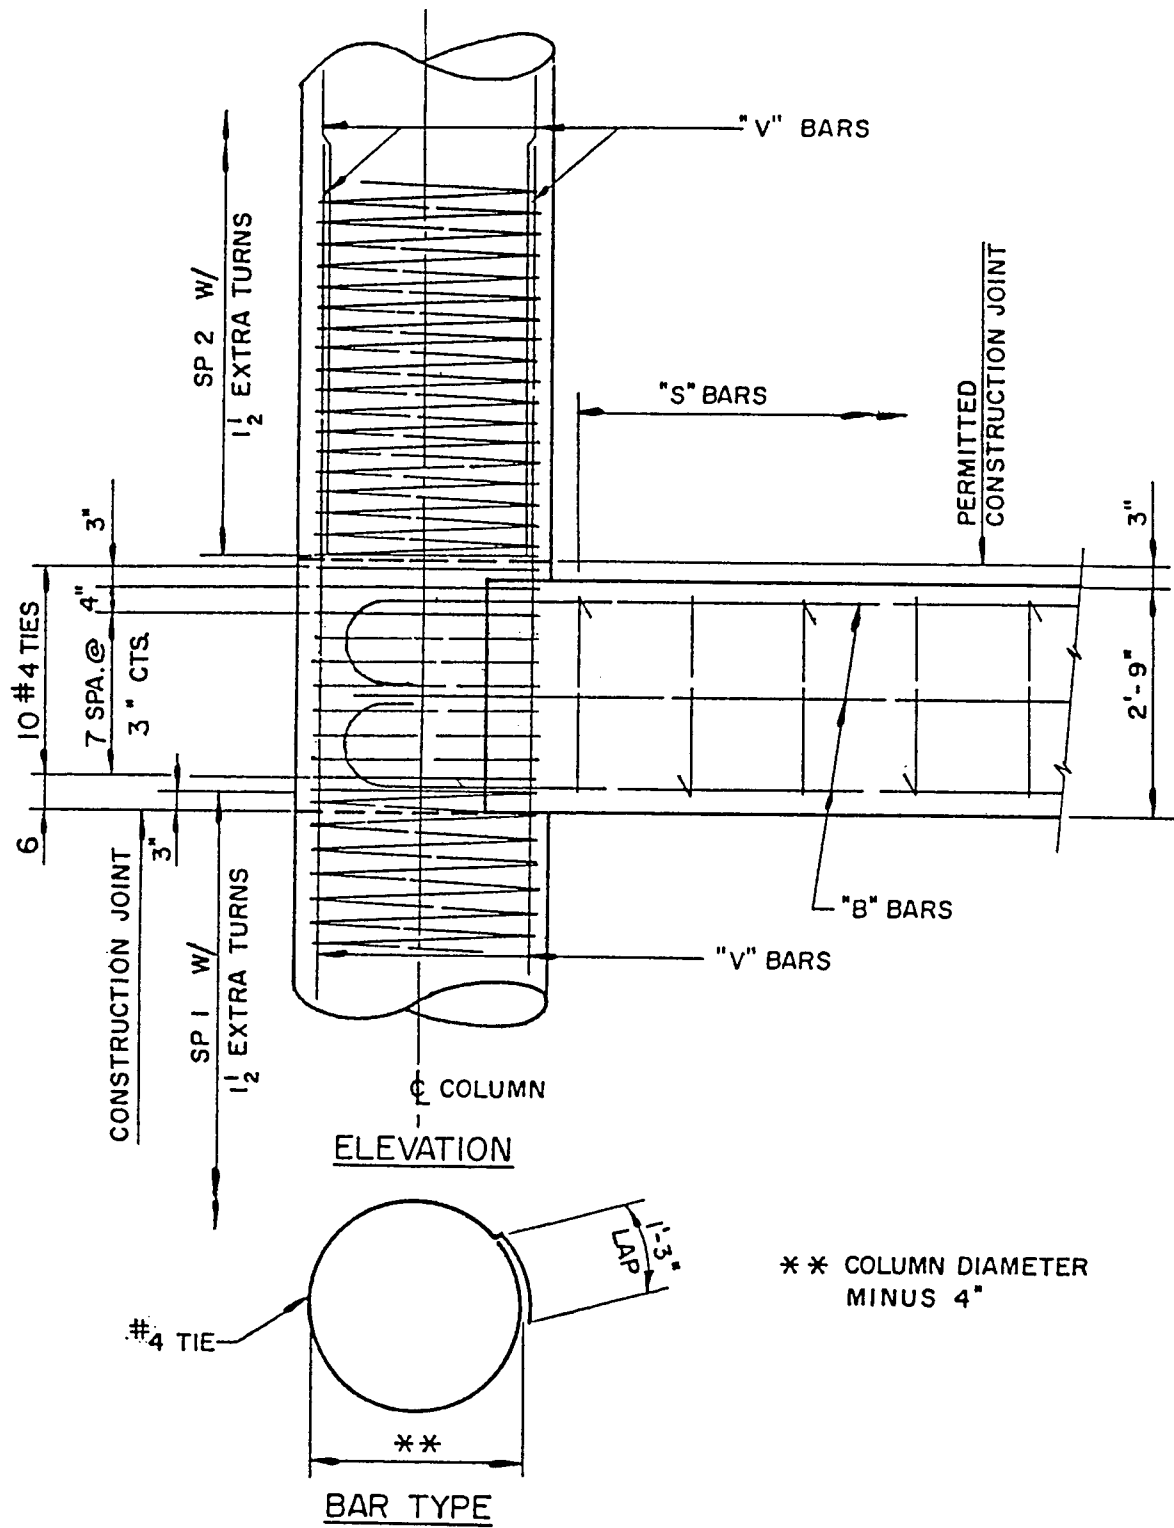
New York Transverse Column Reinforcement Requirements
